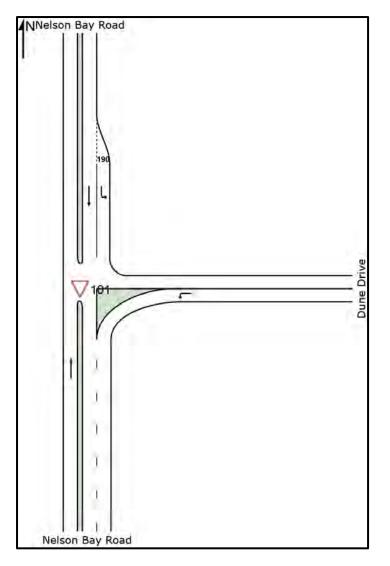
Layout of Nelson Bay Road / Dune Drive, Nelson Bay Road duplicated southbound.
